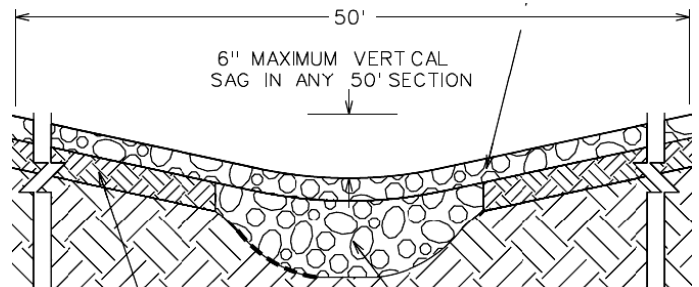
Typical Road Profile Crossing Existing Swale Area
